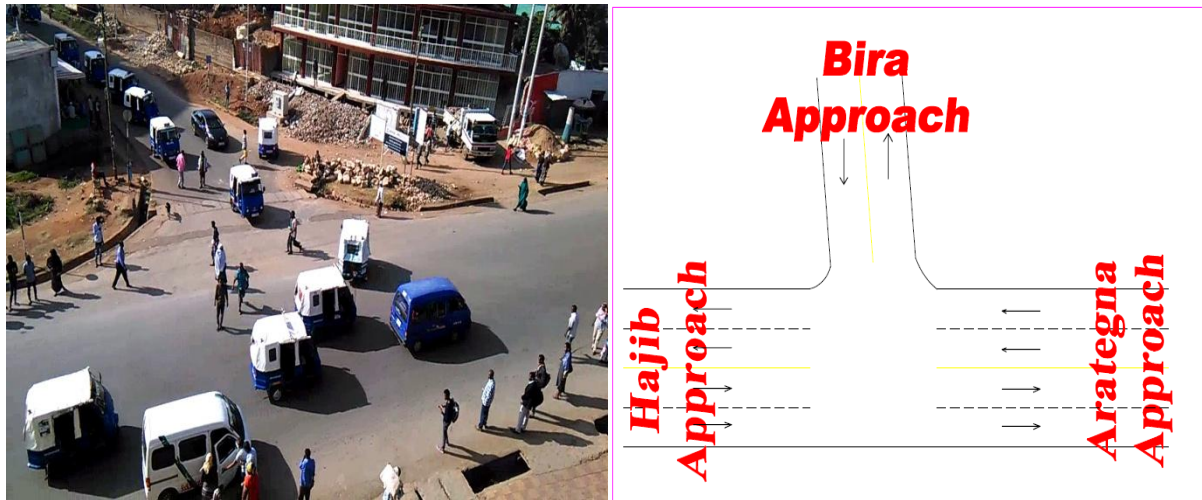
Shash Garage Intersection (Photo and plan view)
